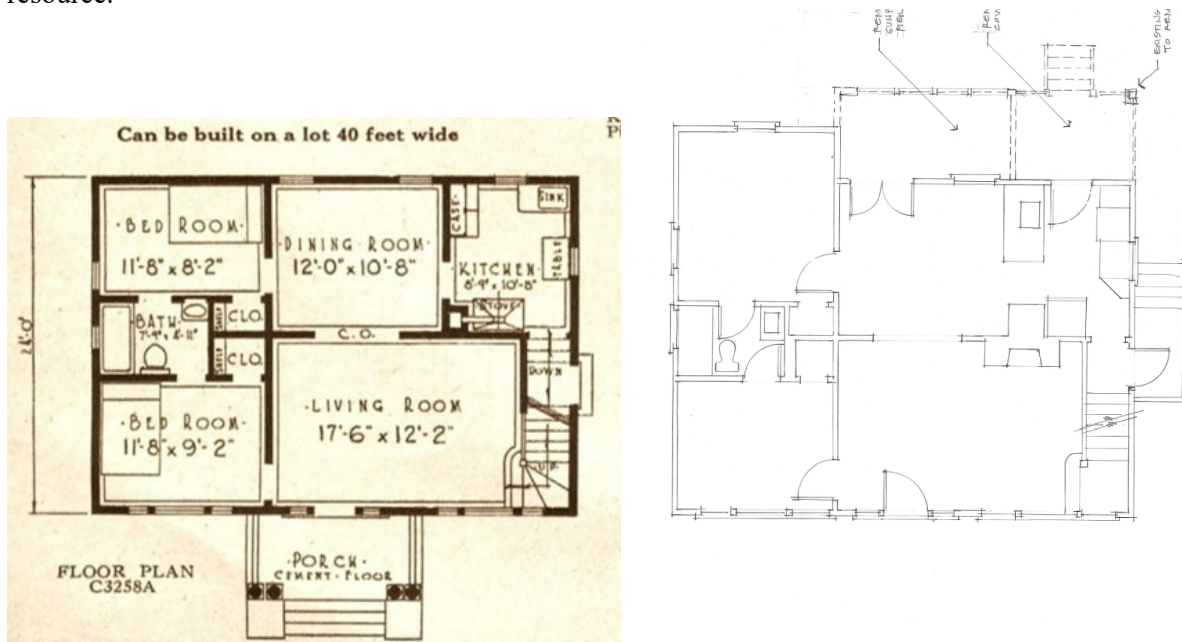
Typical Crescent model floorplan without porch (left) and floorplan of the subject property (right).
